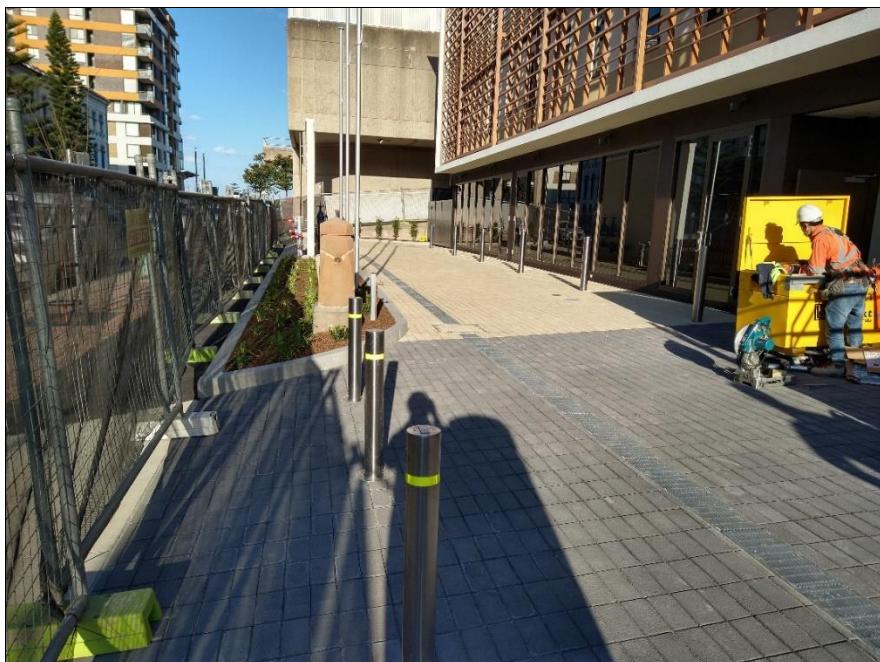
Looking east at concrete paved driveway/footpath and adjacent garden bed along the northern side (front) of the Student Accommodation Building (20 August 2021)
